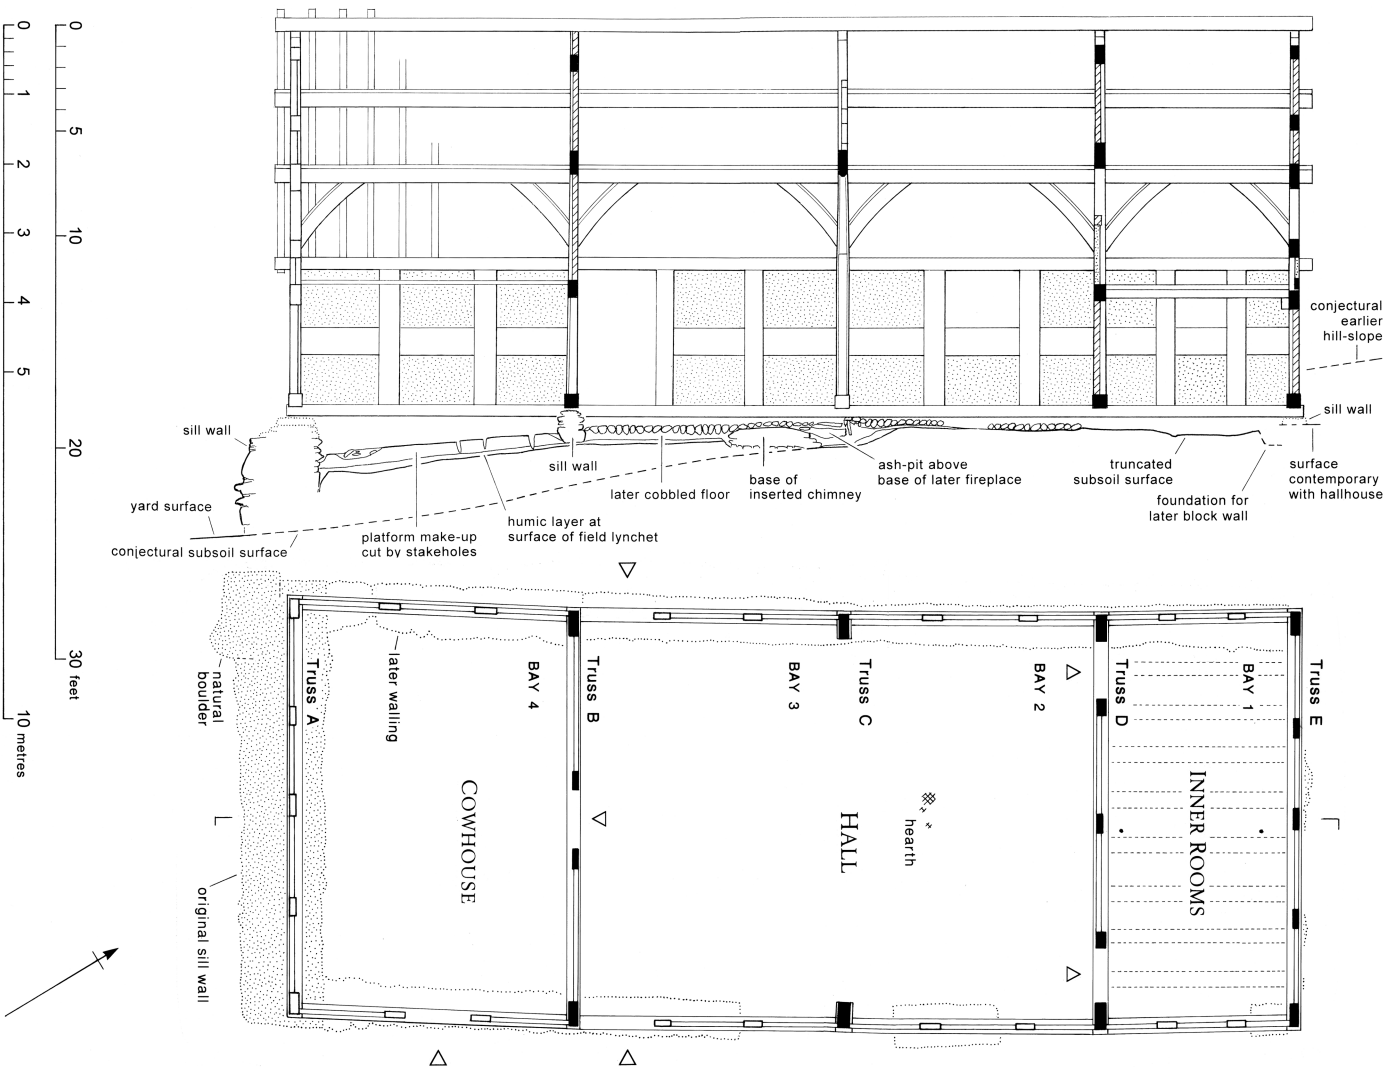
Conjectural plan and long section of the original hallhouse superimposed upon a reconstructed section of structures and layers recorded during excavation in 2003.
